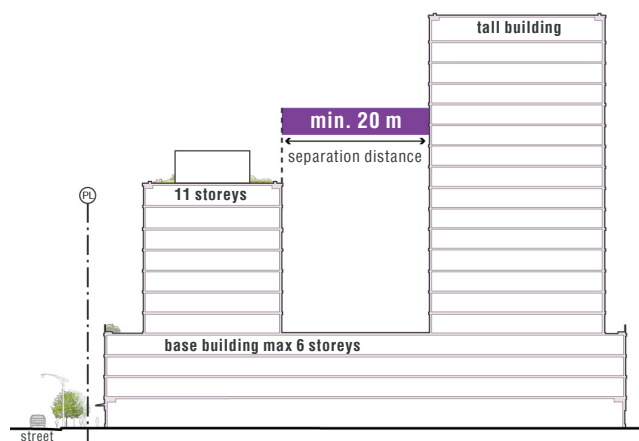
Sample illustration of a mid-rise building that shares a base building with a tall building. A minimum 20- metre separation distance is shown between the mid-rise building and the tall building.
